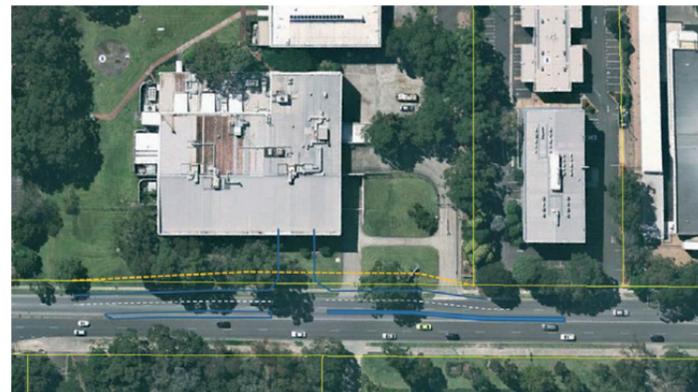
Eastern site access/Talavera Road/Intersection Concept
